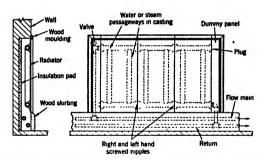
FLAT TYPE PANEL INSTALLED IN WALL RECESS
